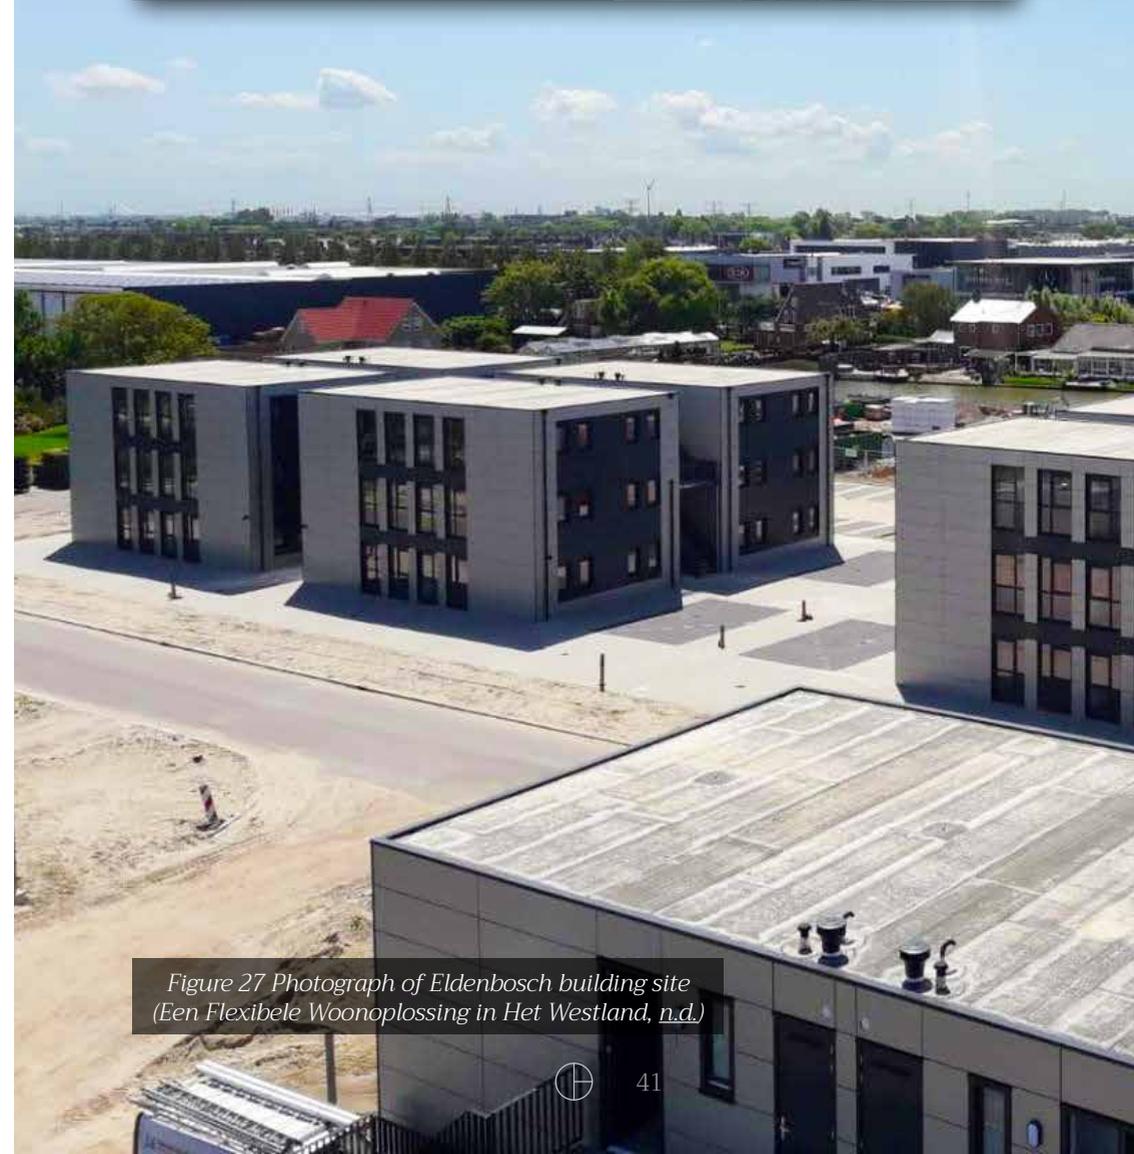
Photograph of Eldenbosch building site (*Een Flexibele Woonoplossing in Het Westland, n.d.*)
